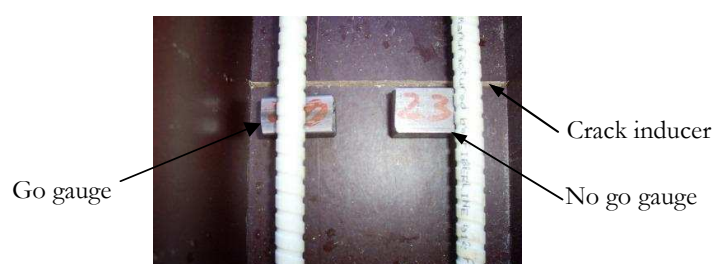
Go-no go gauges and crack inducer in a mould with FRP bars.
